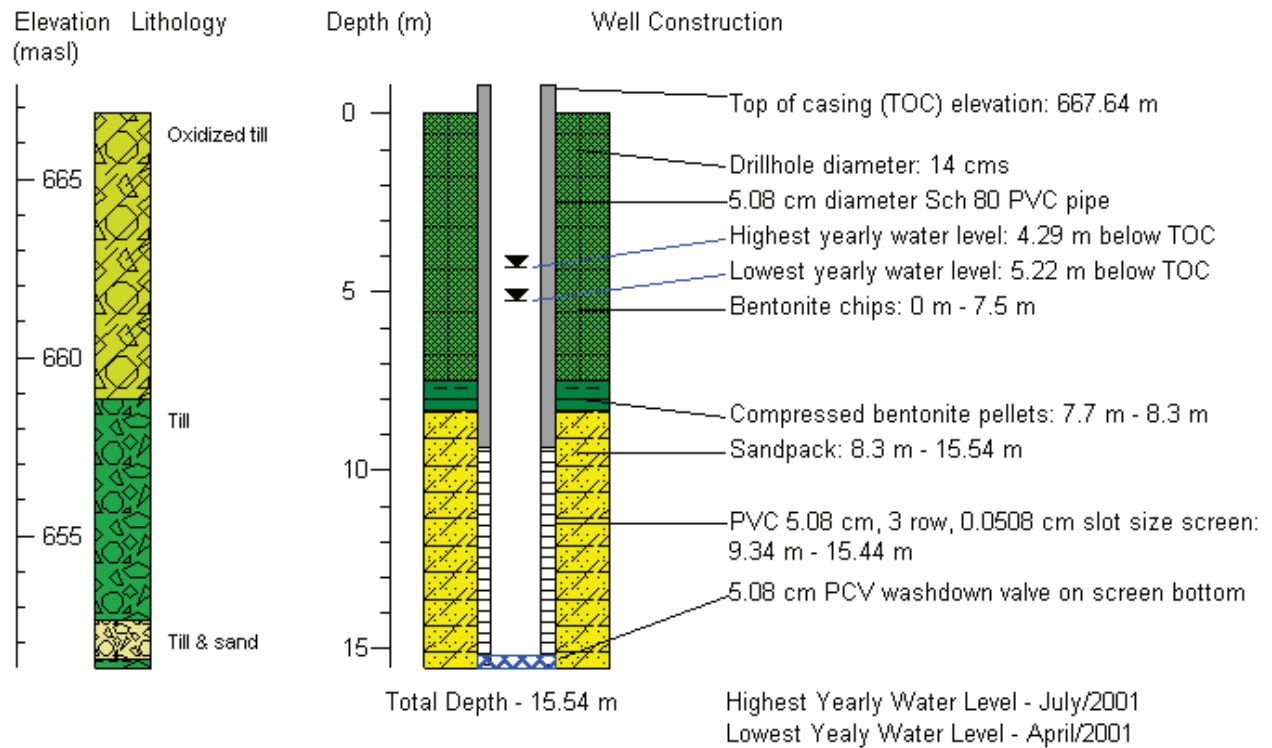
Water-table well construction details: WEPA 00-1-WT
